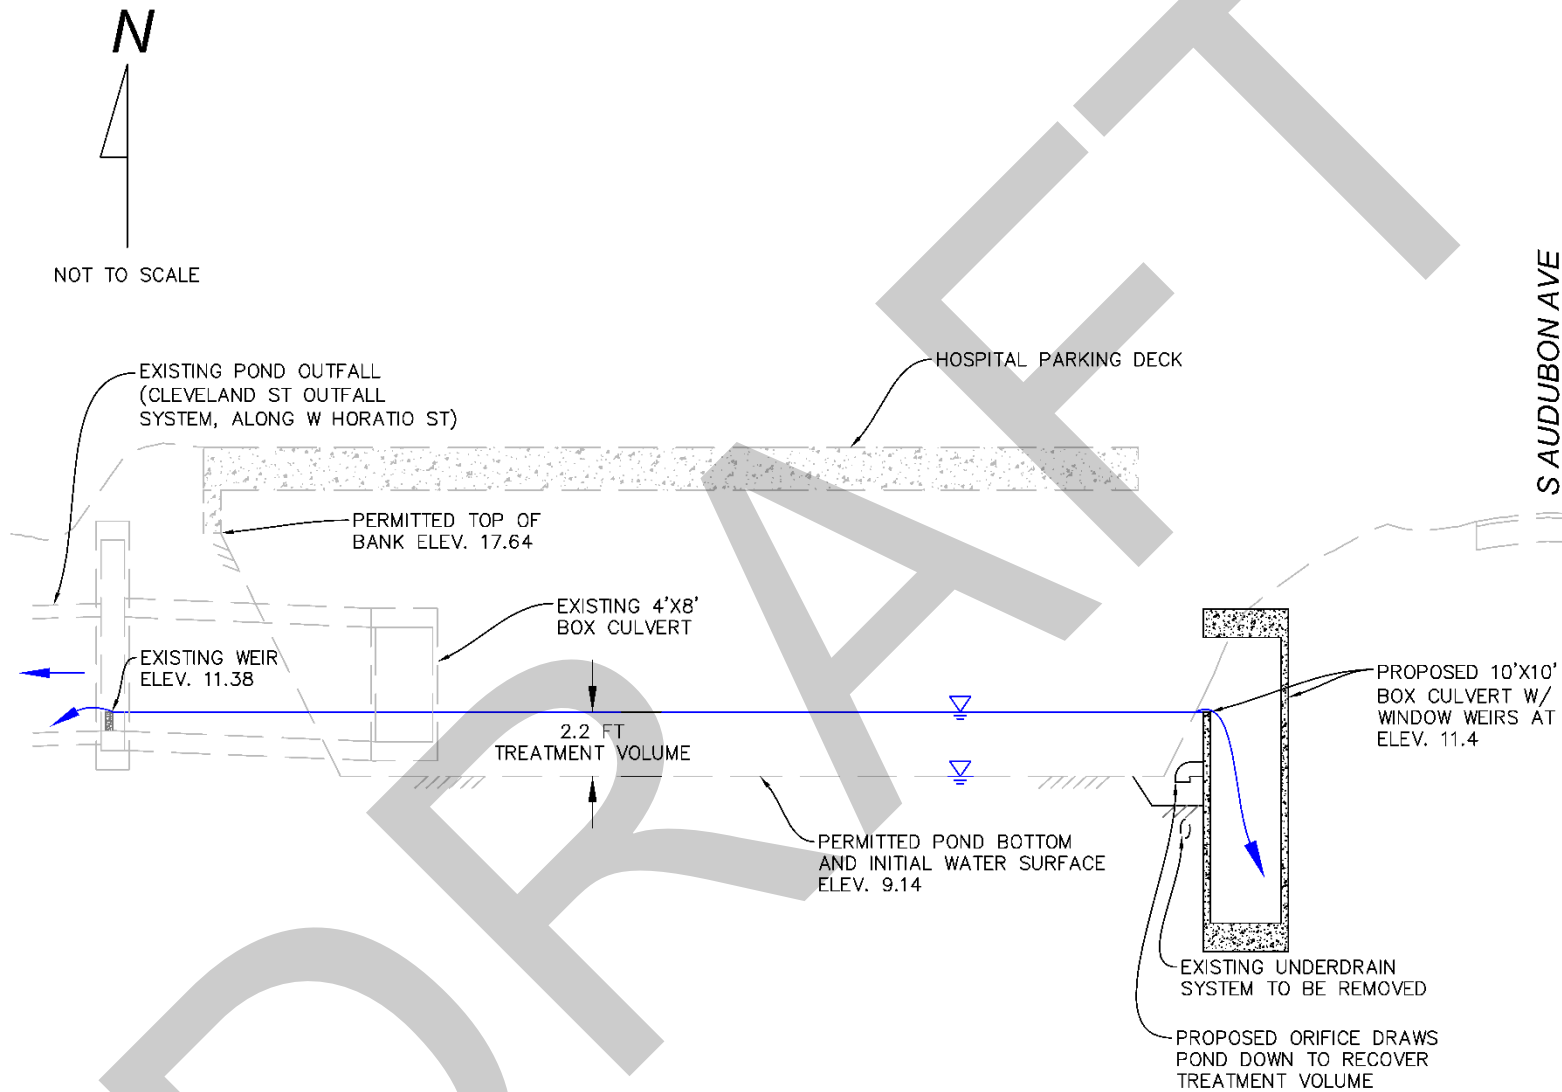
Conceptual Proposed Box Culvert Connection to AMI Pond
